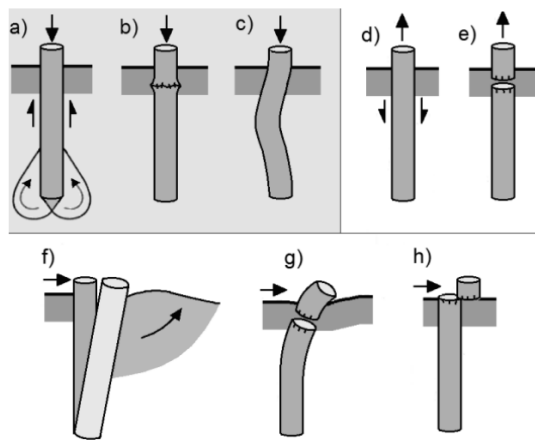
Pile failure a)-c) compression d)-e) tension f)-h) transverse loading adopted from
